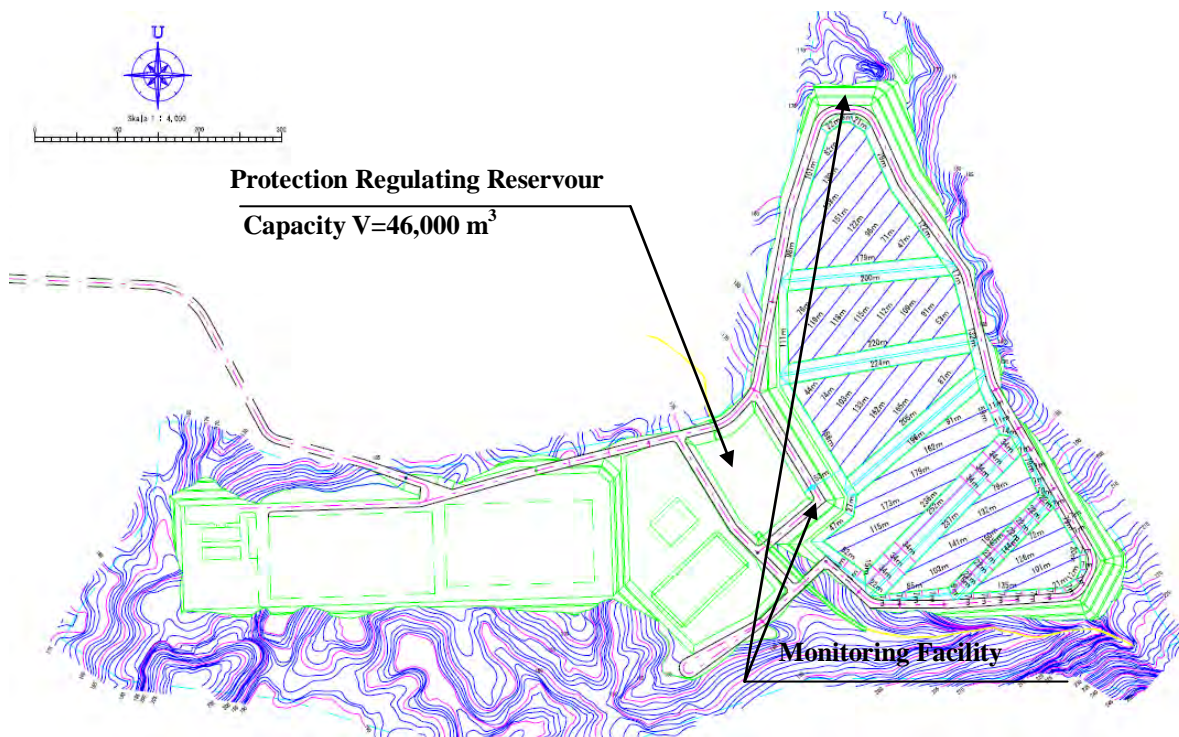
Plan for Groundwater Collecting and Drainage System
